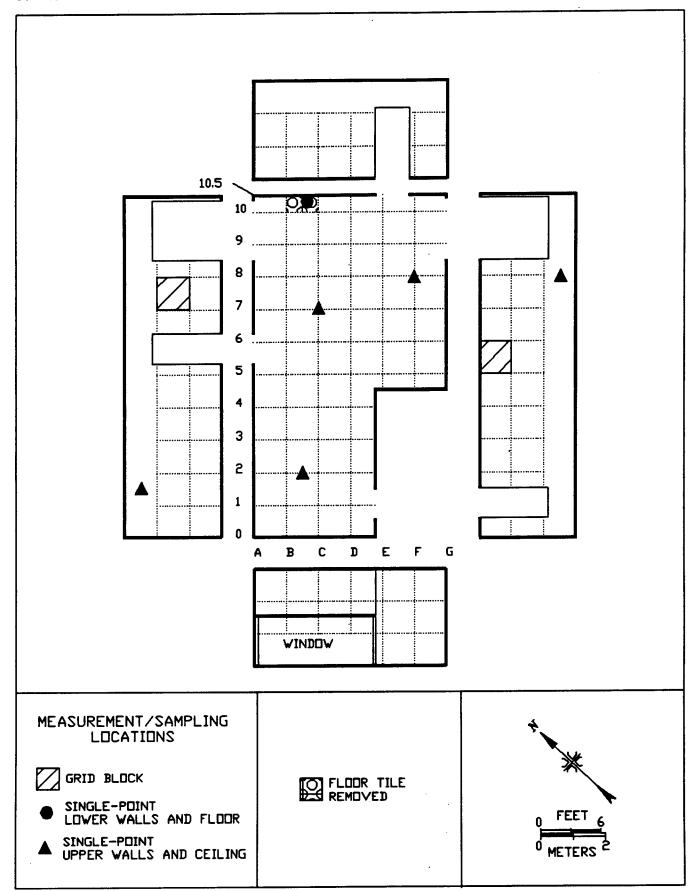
Building 005, Room 108 - Measurement and Sampling Locations
